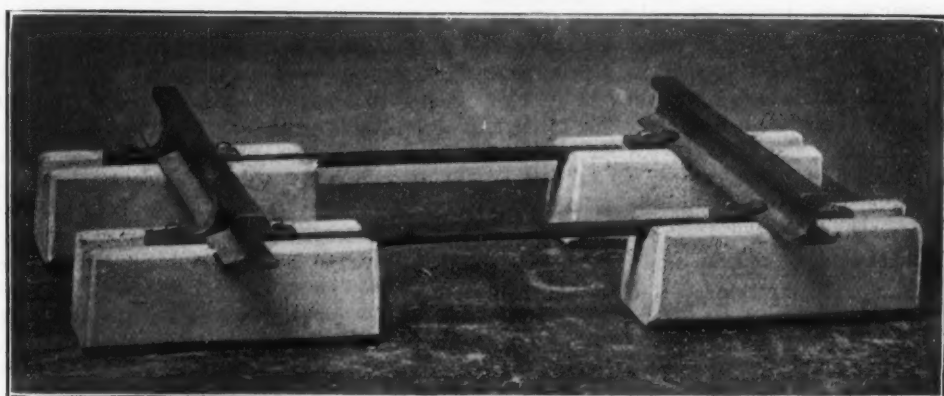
Model of the Corell Steel and Concrete Railroad Tie.
